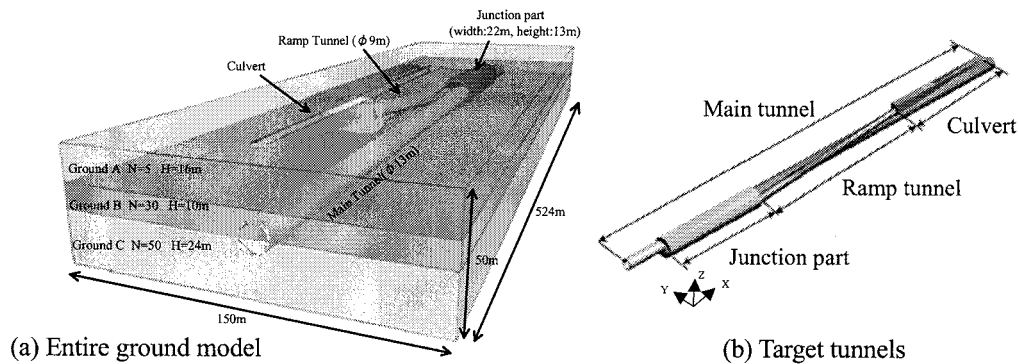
Analysis model of underground Expressway tunnels with a side ramp tunnel
